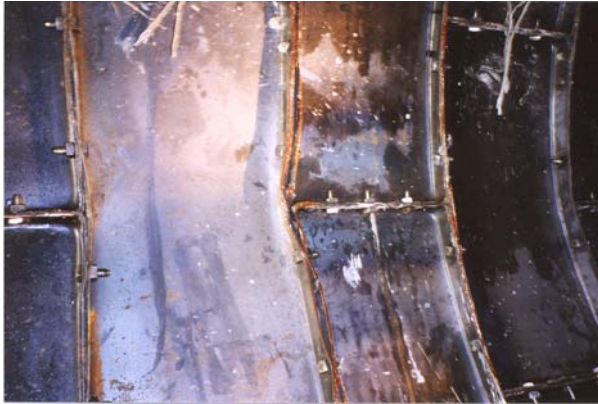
Damage to liner plates in one tunneling application at an estimated jacking load of 240 tons.
